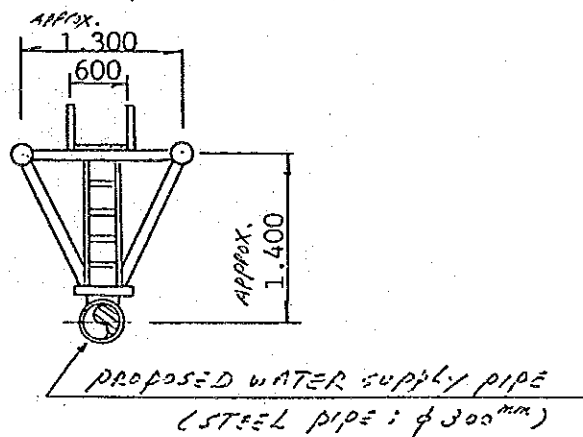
DETAIL OF WATER PIPE BRIDGE NEAR INTAKE
